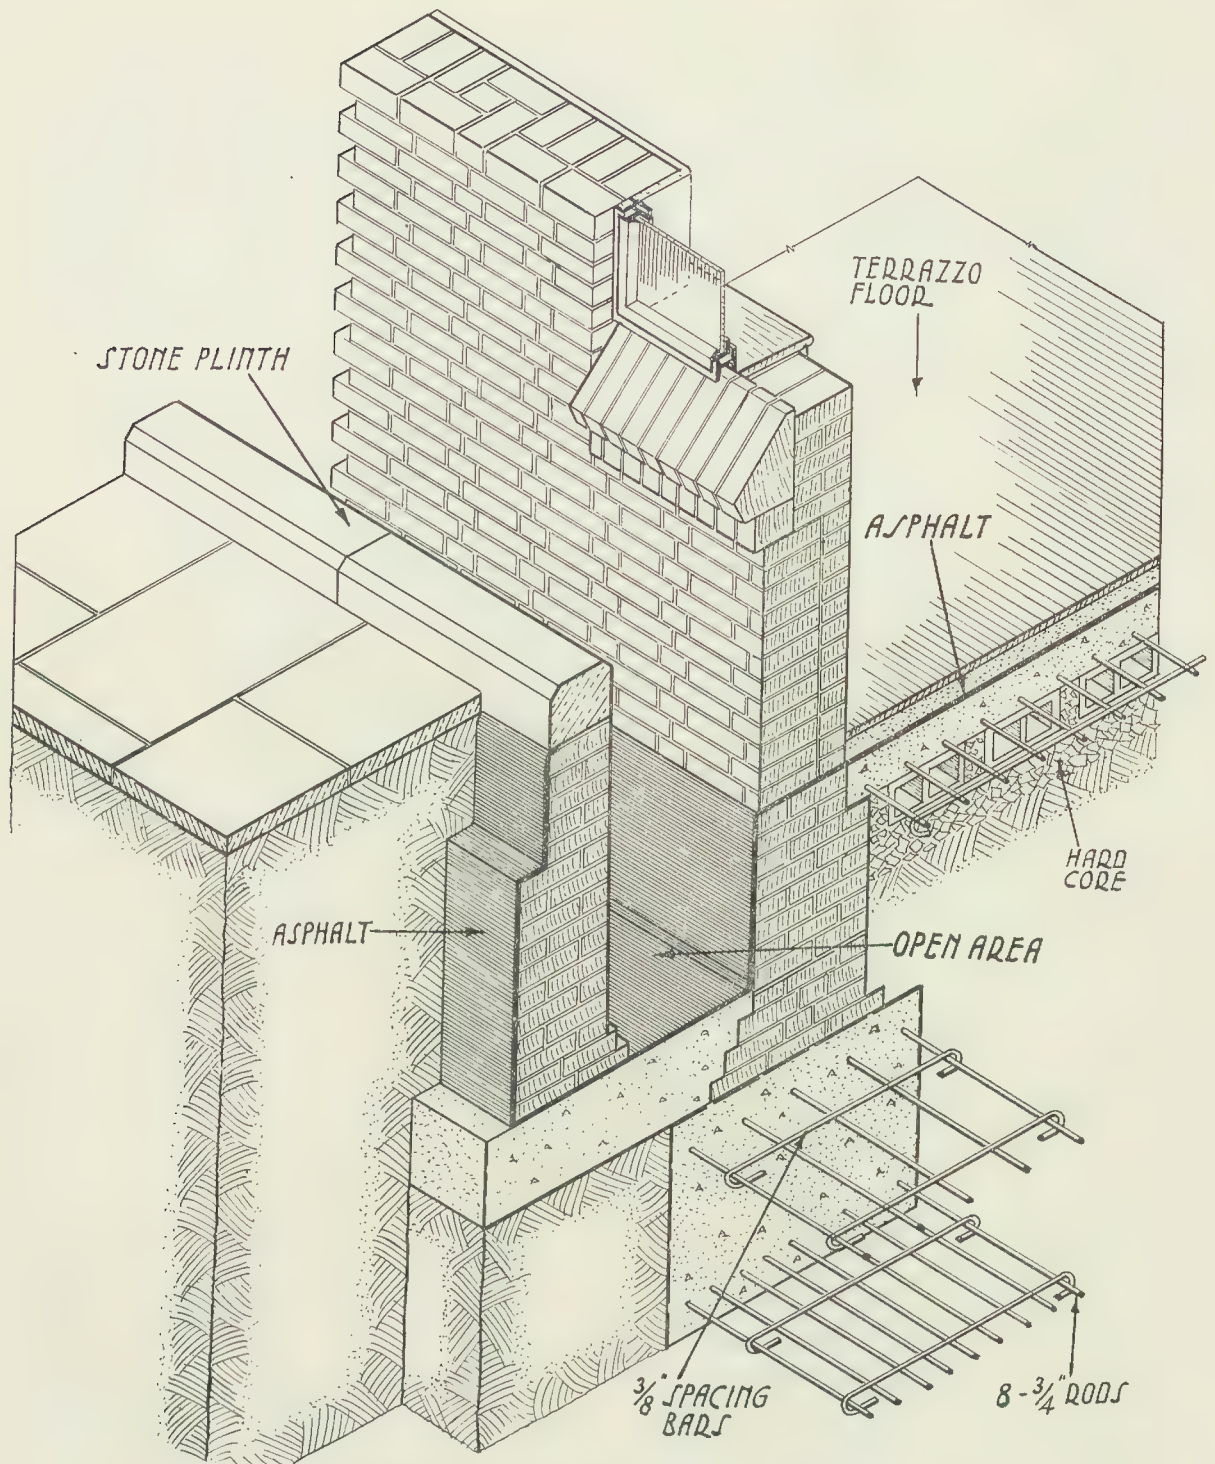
REINFORCED CONCRETE BEAM FOUNDATIONS FOR A BRICK WALL
